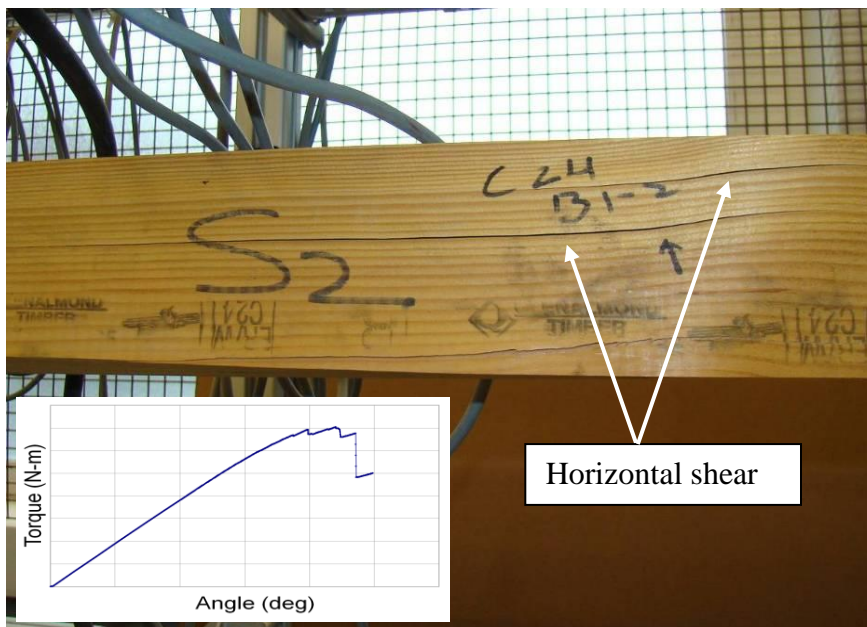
A typical wide shear cracks occurred in C24 timber joists under torsion loading.
